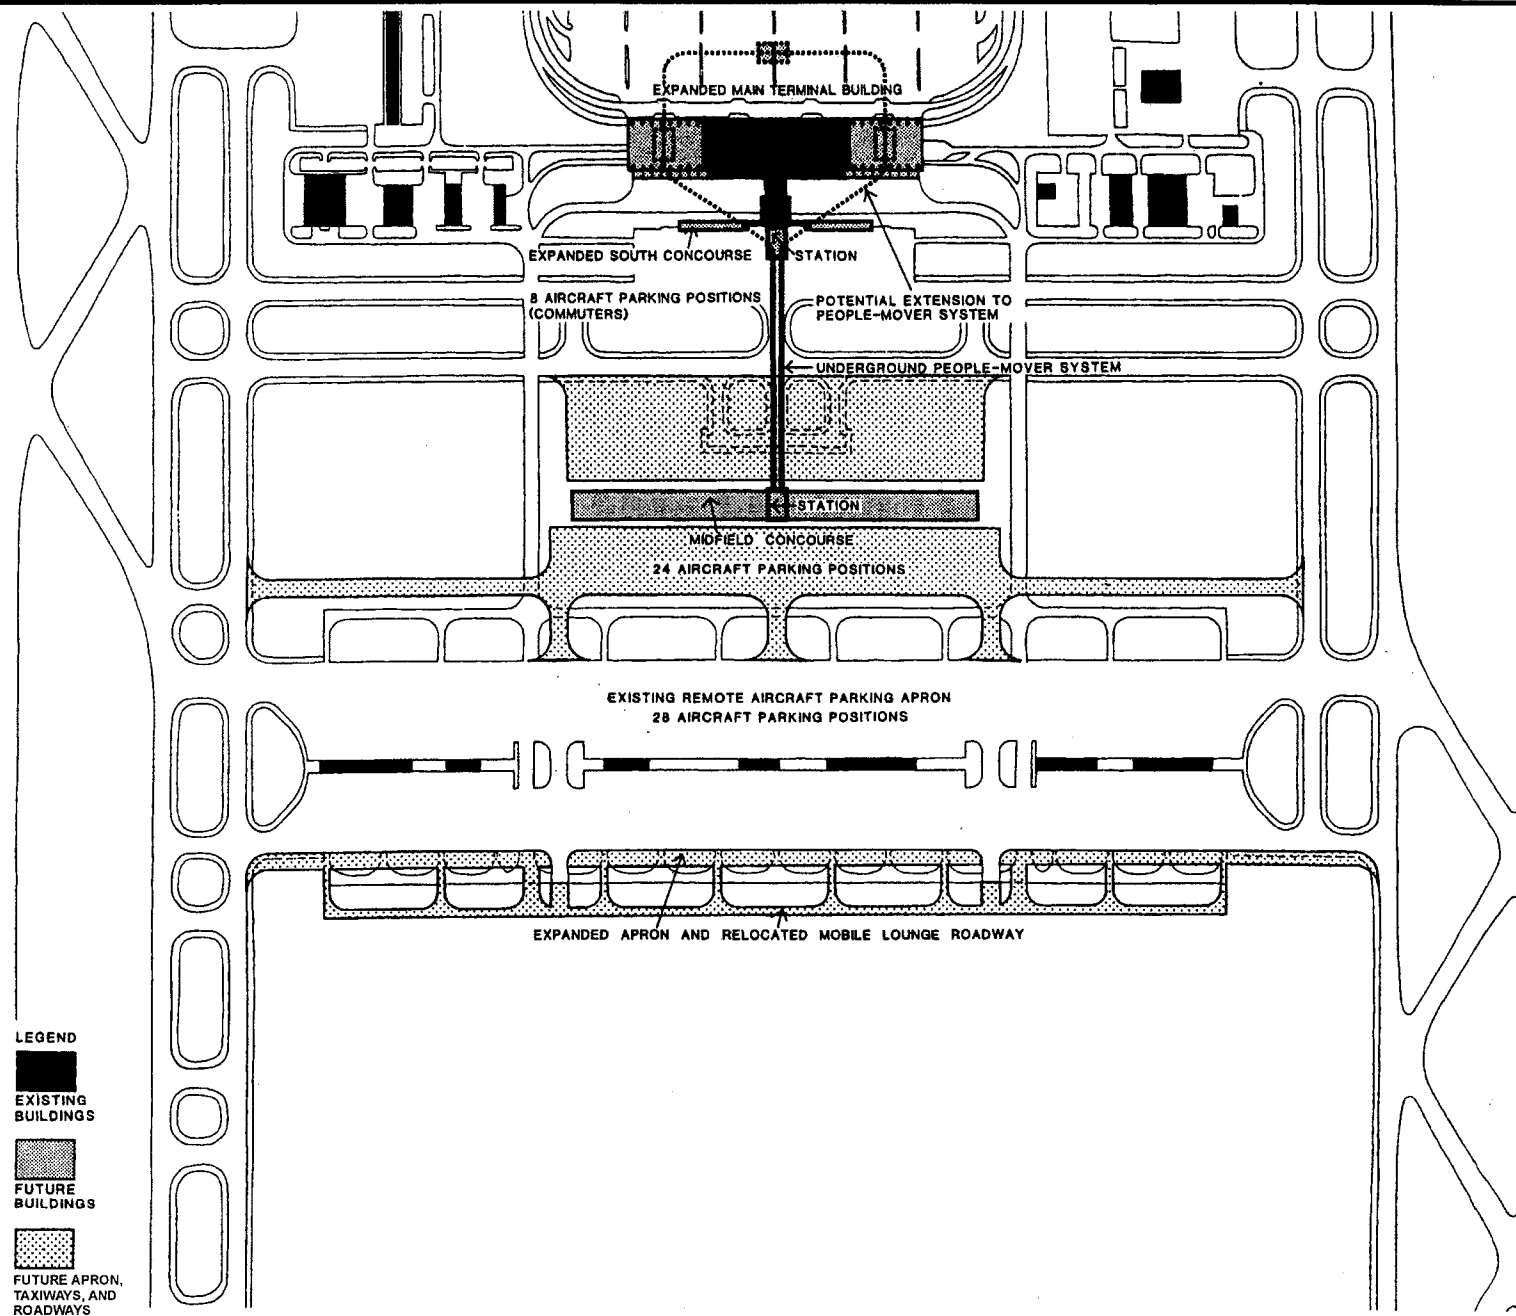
Washington Dulles International Airport Master Plan (1985): Terminal Concept D.
